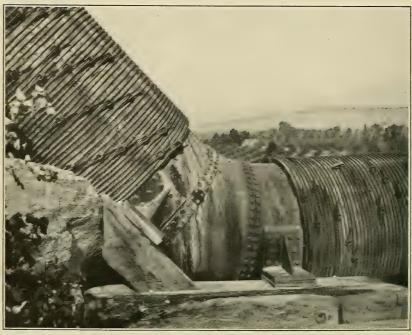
Steel Angle in 44-Inch Pipe, Showing Method of Joining Wood and Steel and Method of Anchoring Pipe on Steep Slope.
